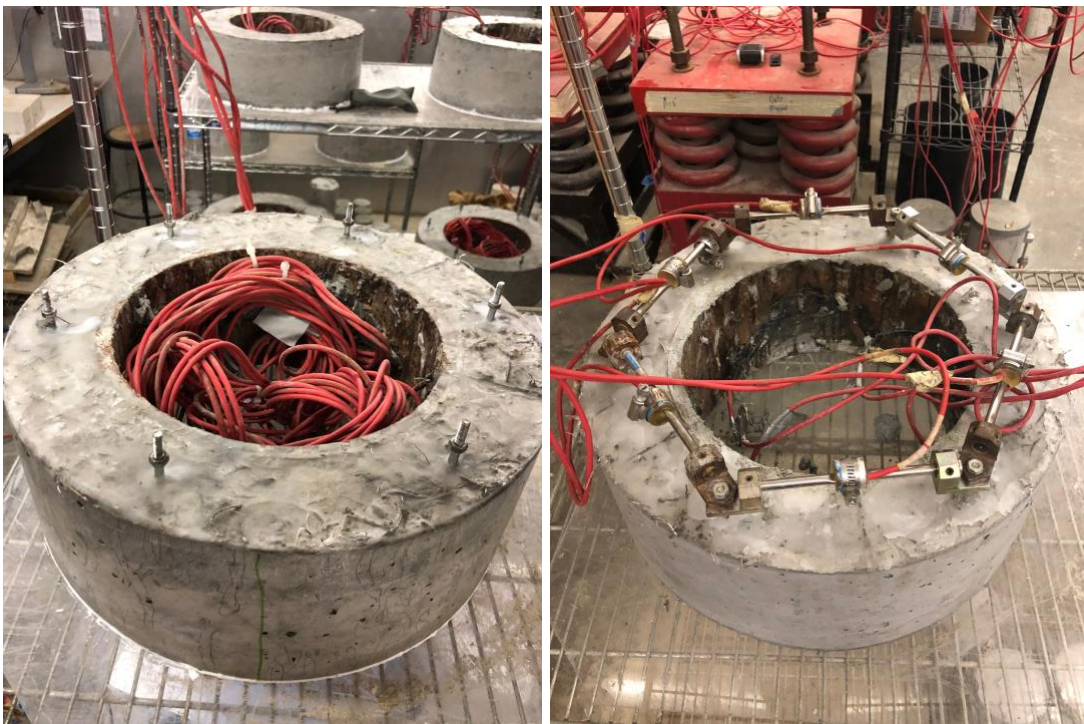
Modified AASHTO ring specimen with VWSGs
